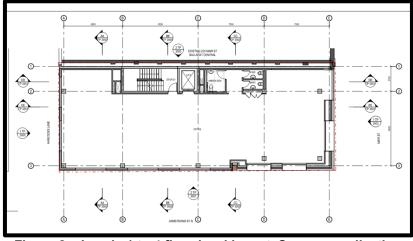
Levels 1 to 4 floor level layout, Source: application
